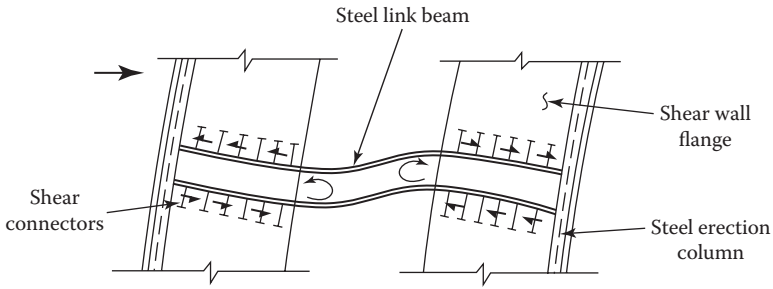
Moment transfer between steel link and beam and concrete wall.
